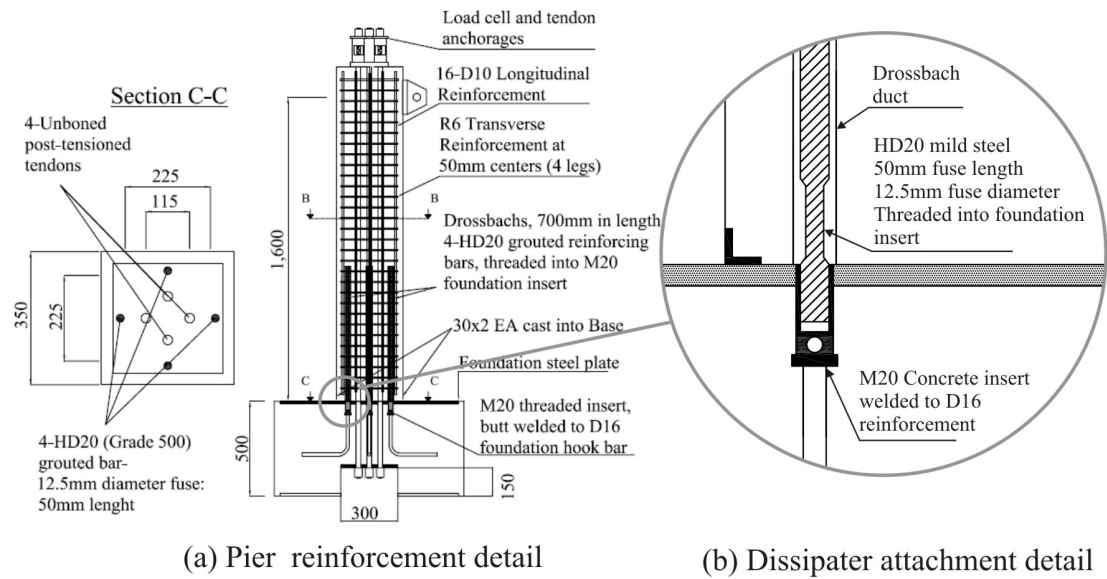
Reinforcement details of the foundation and pier elements
